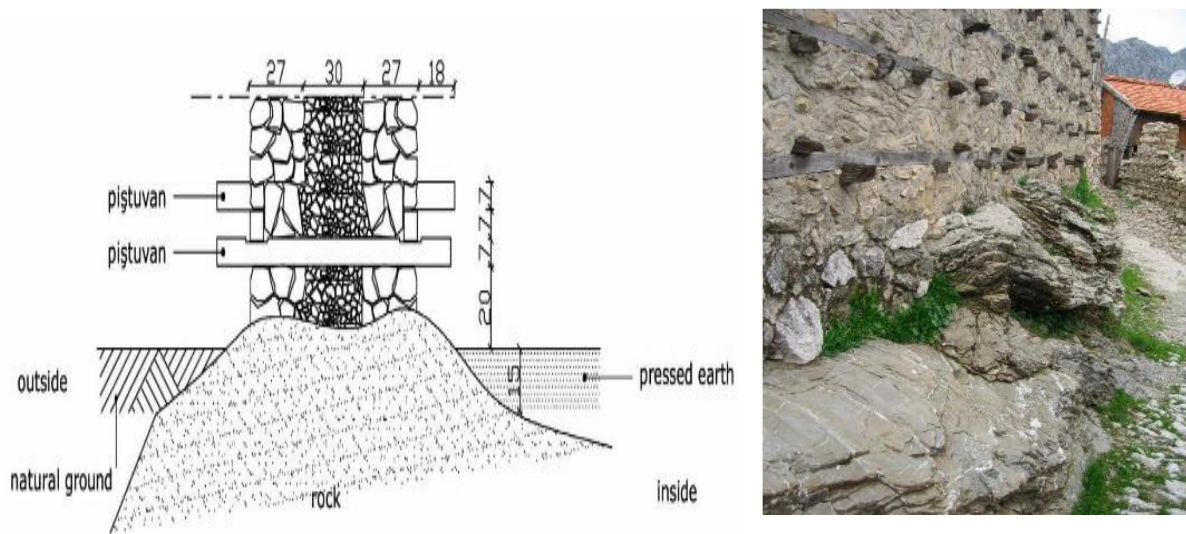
Detailed Section of Foundation (Type -A) (Çelik, 2009).
